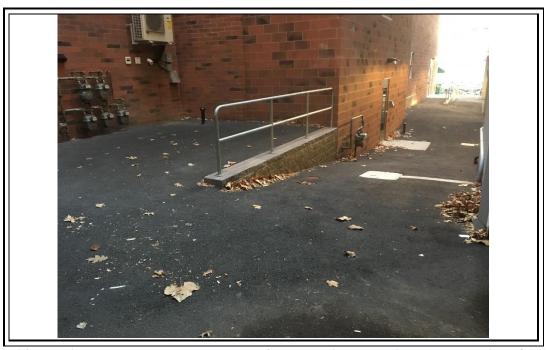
Looking south-southwest; paved surface cover in area adjacent to rear side of 140 State Street building; south side of parking garage visible at far right in photo (12/10/18).
